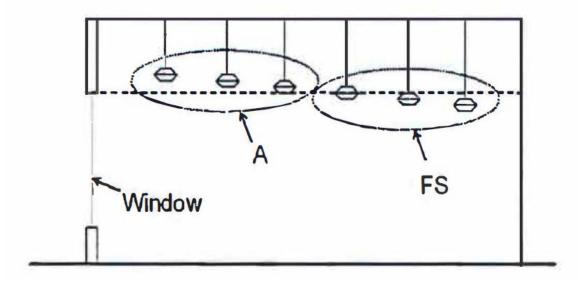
Figure A: Elevation view showing an application of indoor lighting, labeled 'FS,' which is subject to these requirements and indoor lighting, labeled 'A,' which is installed so that it is typically not subject to these requirements.
